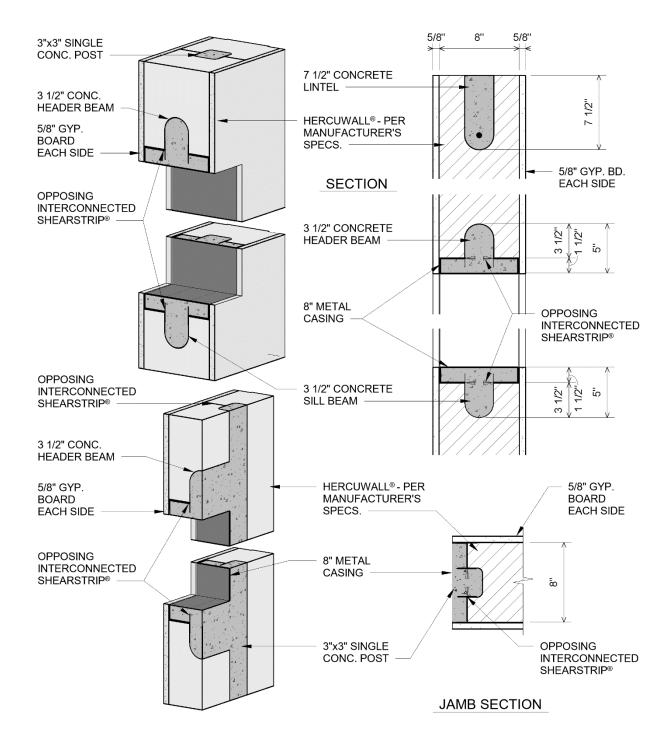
HercuWall® Openings (Window and Door) Opening Design for Types I-V Construction
